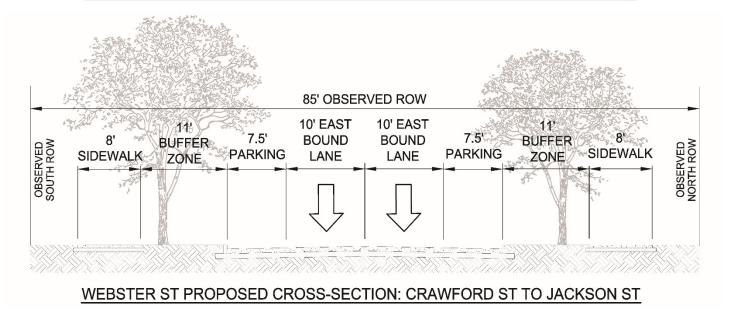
Existing and Proposed Cross Sections for Webster Street Safety Improvements Project
